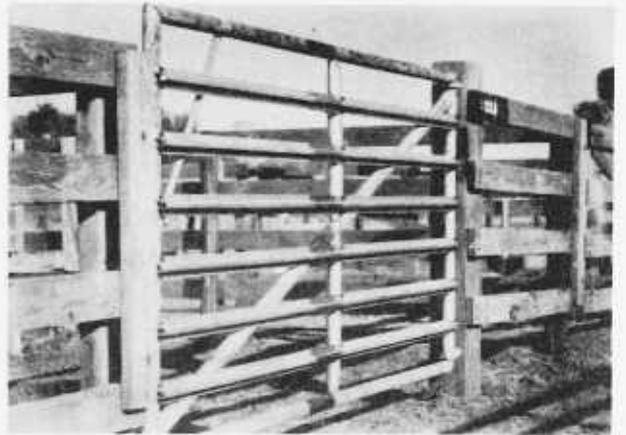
Aluminum rails and welded pipe-frame gate.
